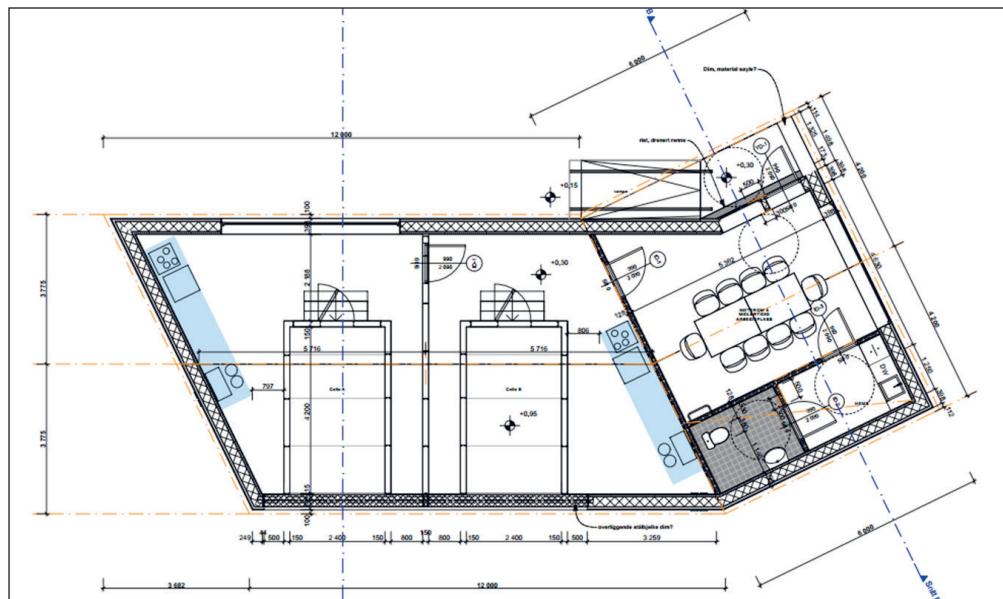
Floor plan of ZEB Test Cell Laboratory, showing the two test cells facing the south façade of the building. Main architect is Luca Finocchiaro, Faculty of Architecture and Fine Art, NTNU.
